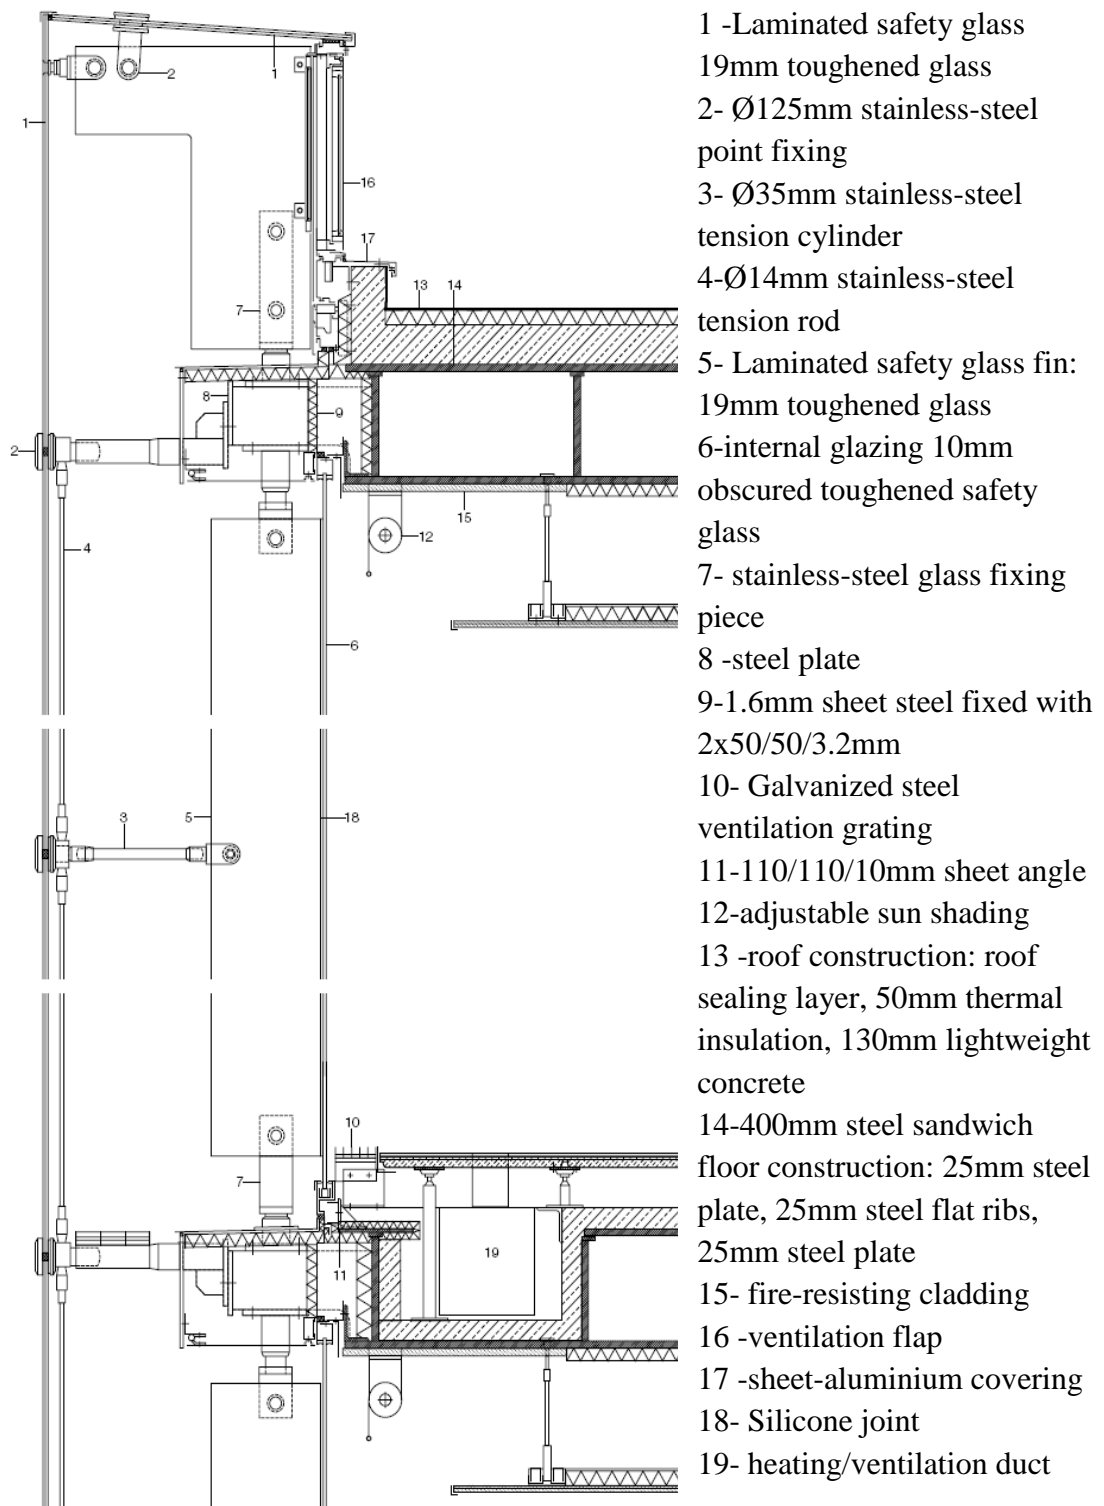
Glass Detail of Structural Glazing Curtain Wall System of Sendai Media Center (south), (Schittich, C. 2001).
